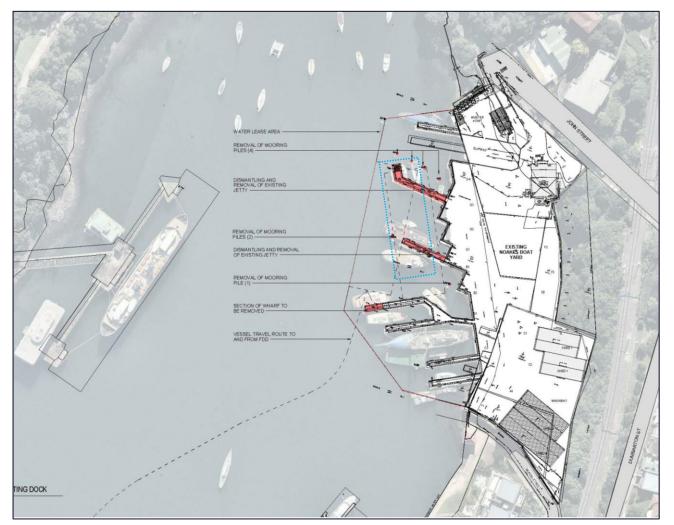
Proposed Site Plan with wharves and mooring piles to be removed in red and the location of the FDD outlined in blue (extract from plan by Altis Architecture 2017)
